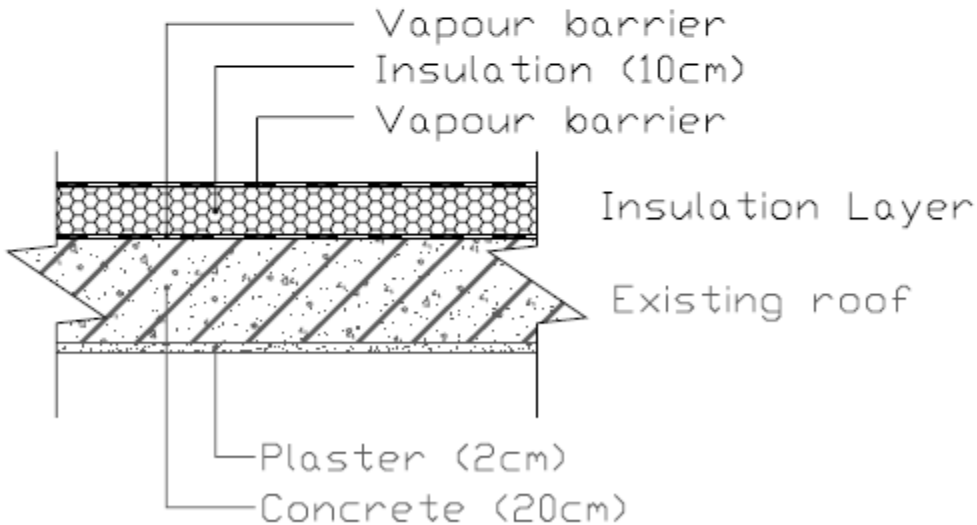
Section of insulation layer on the existing concrete slab of the roof
